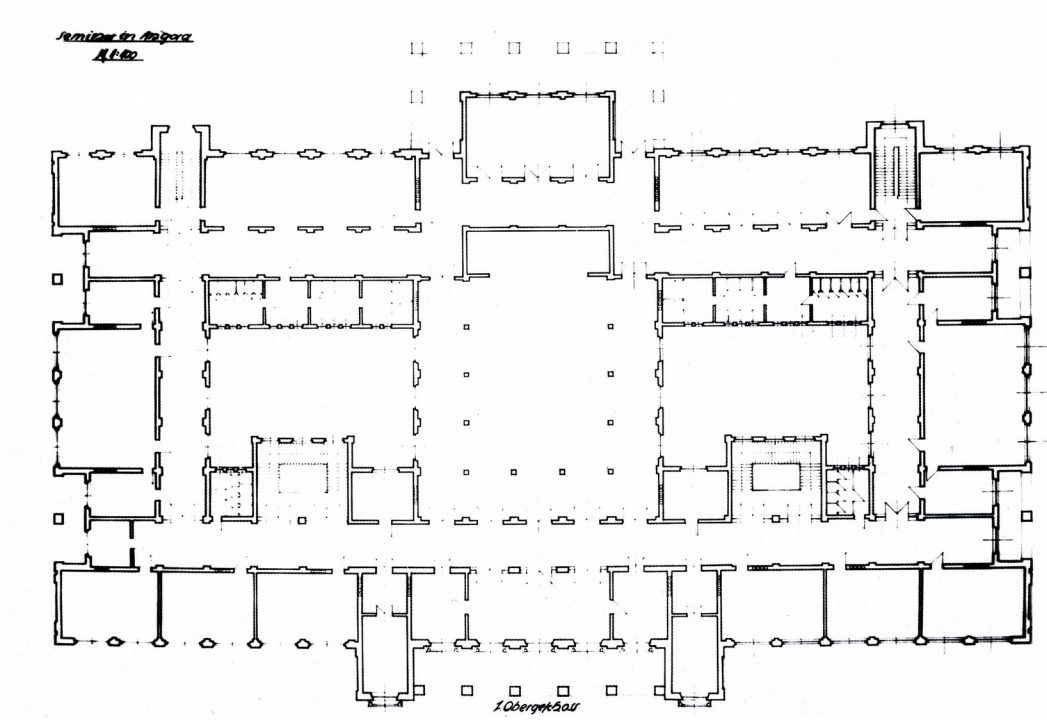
Gazi Institute, ground plan first floor (Reproduction from Yavuz 2009, 251).
